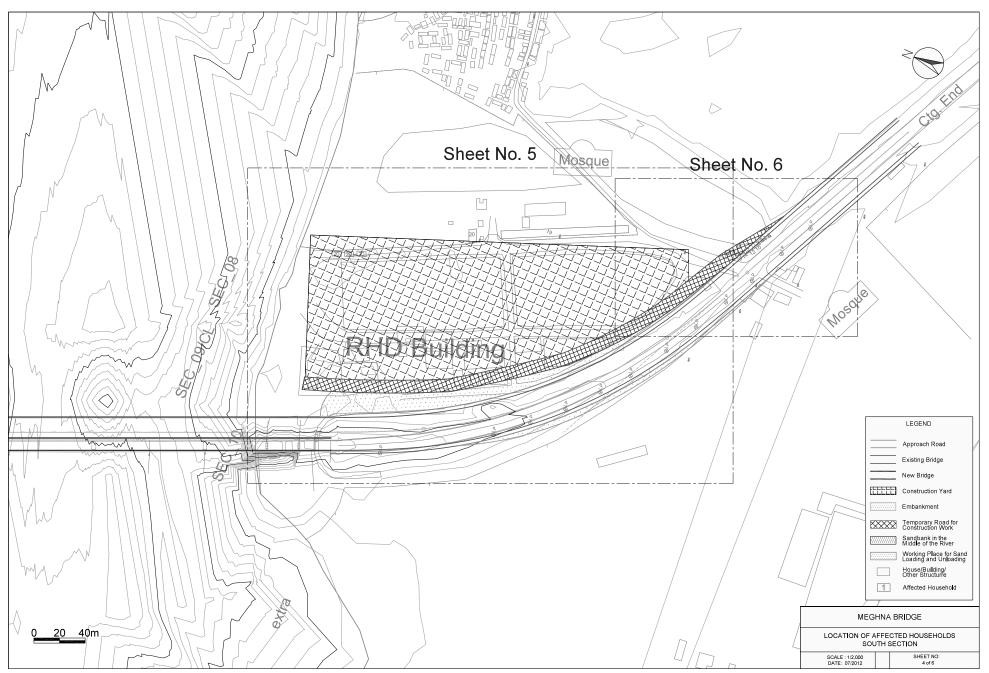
Location of Affected Households South Section (Sheet No.4)
